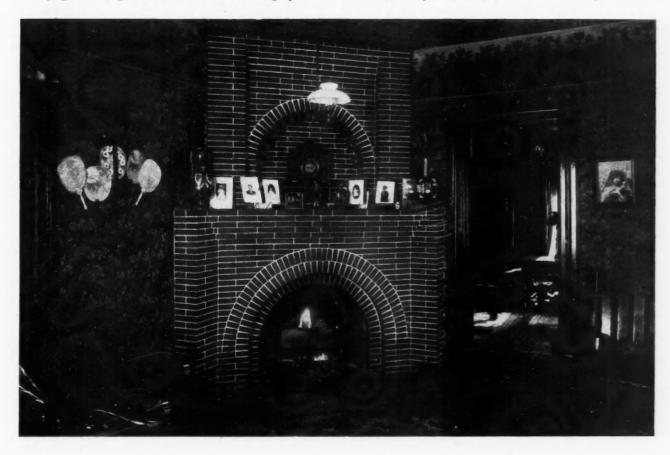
DETAILED DESCRIPTION OF HOW TO CONSTRUCT A BRICK FIREPLACE—AMOUNT AND COST OF
